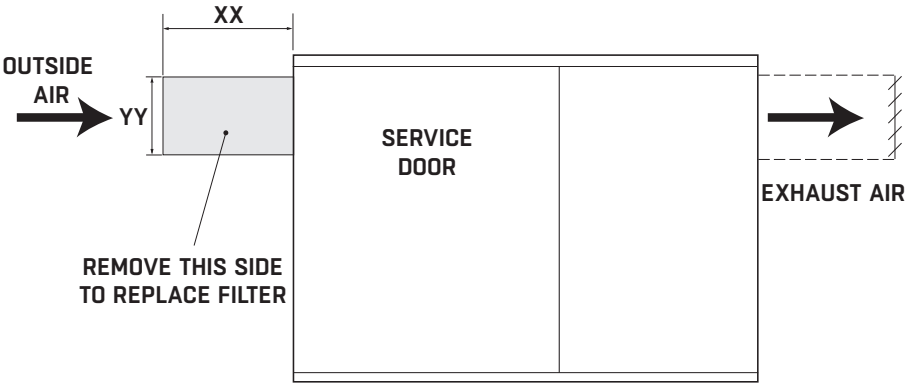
Front view of the FläktGroup SEMCO FV-TS Pre-conditioner with attached indoor filter assembly.
